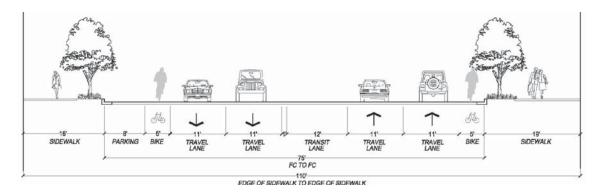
Recommended mid-block cross-section of 18th Street S. looking west between Crystal Drive and S. Clark/Bell Street
